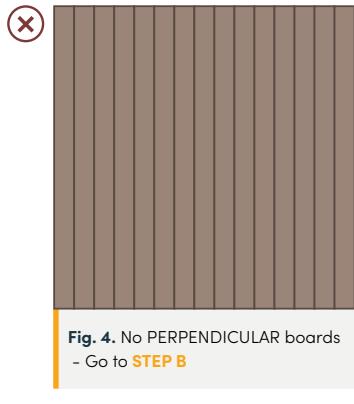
No PERPENDICULAR boards - Go to STEP B
